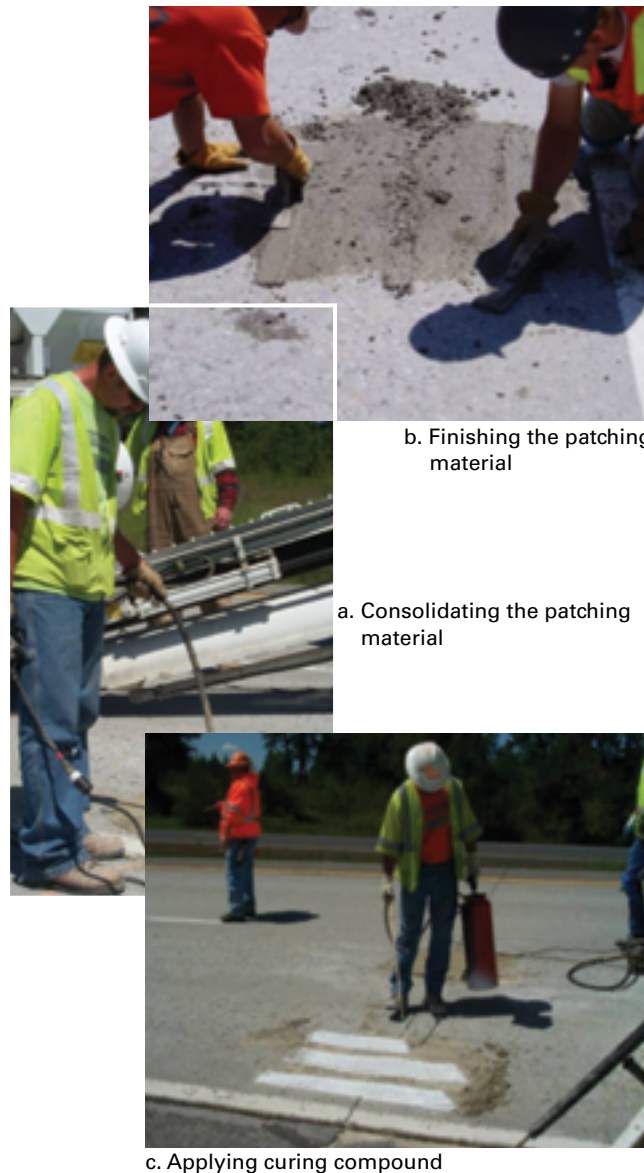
Patching material placement (Pierce, Uhlmeier, and Weston 2009)
